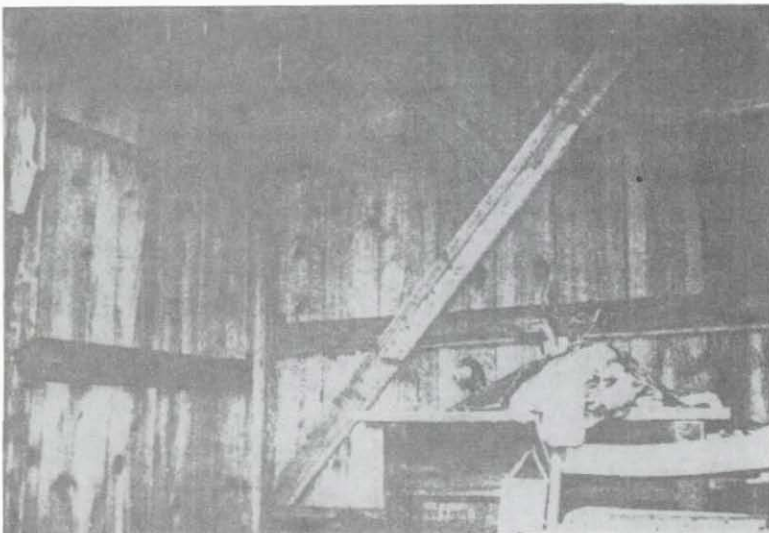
INEFFICIENT DIAGONAL BRACING
